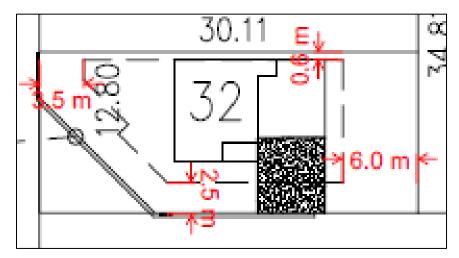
Proposed layout of Lot 32 showing dwelling that meets all setbacks of the R1D-6 Zone
